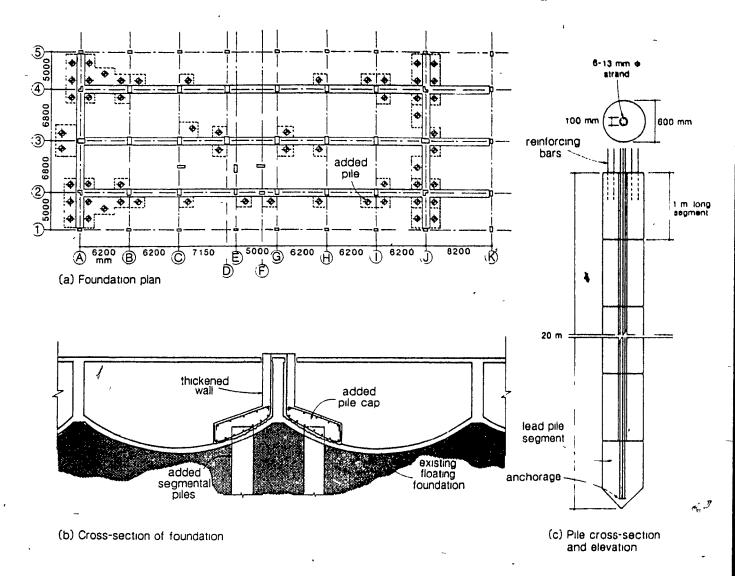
The 20 m long end-bearing piles consisted of 20 - 1 m long segments. This length of piles was required to reach the stiffer sand layer located at about 20 m below the foundation level.
